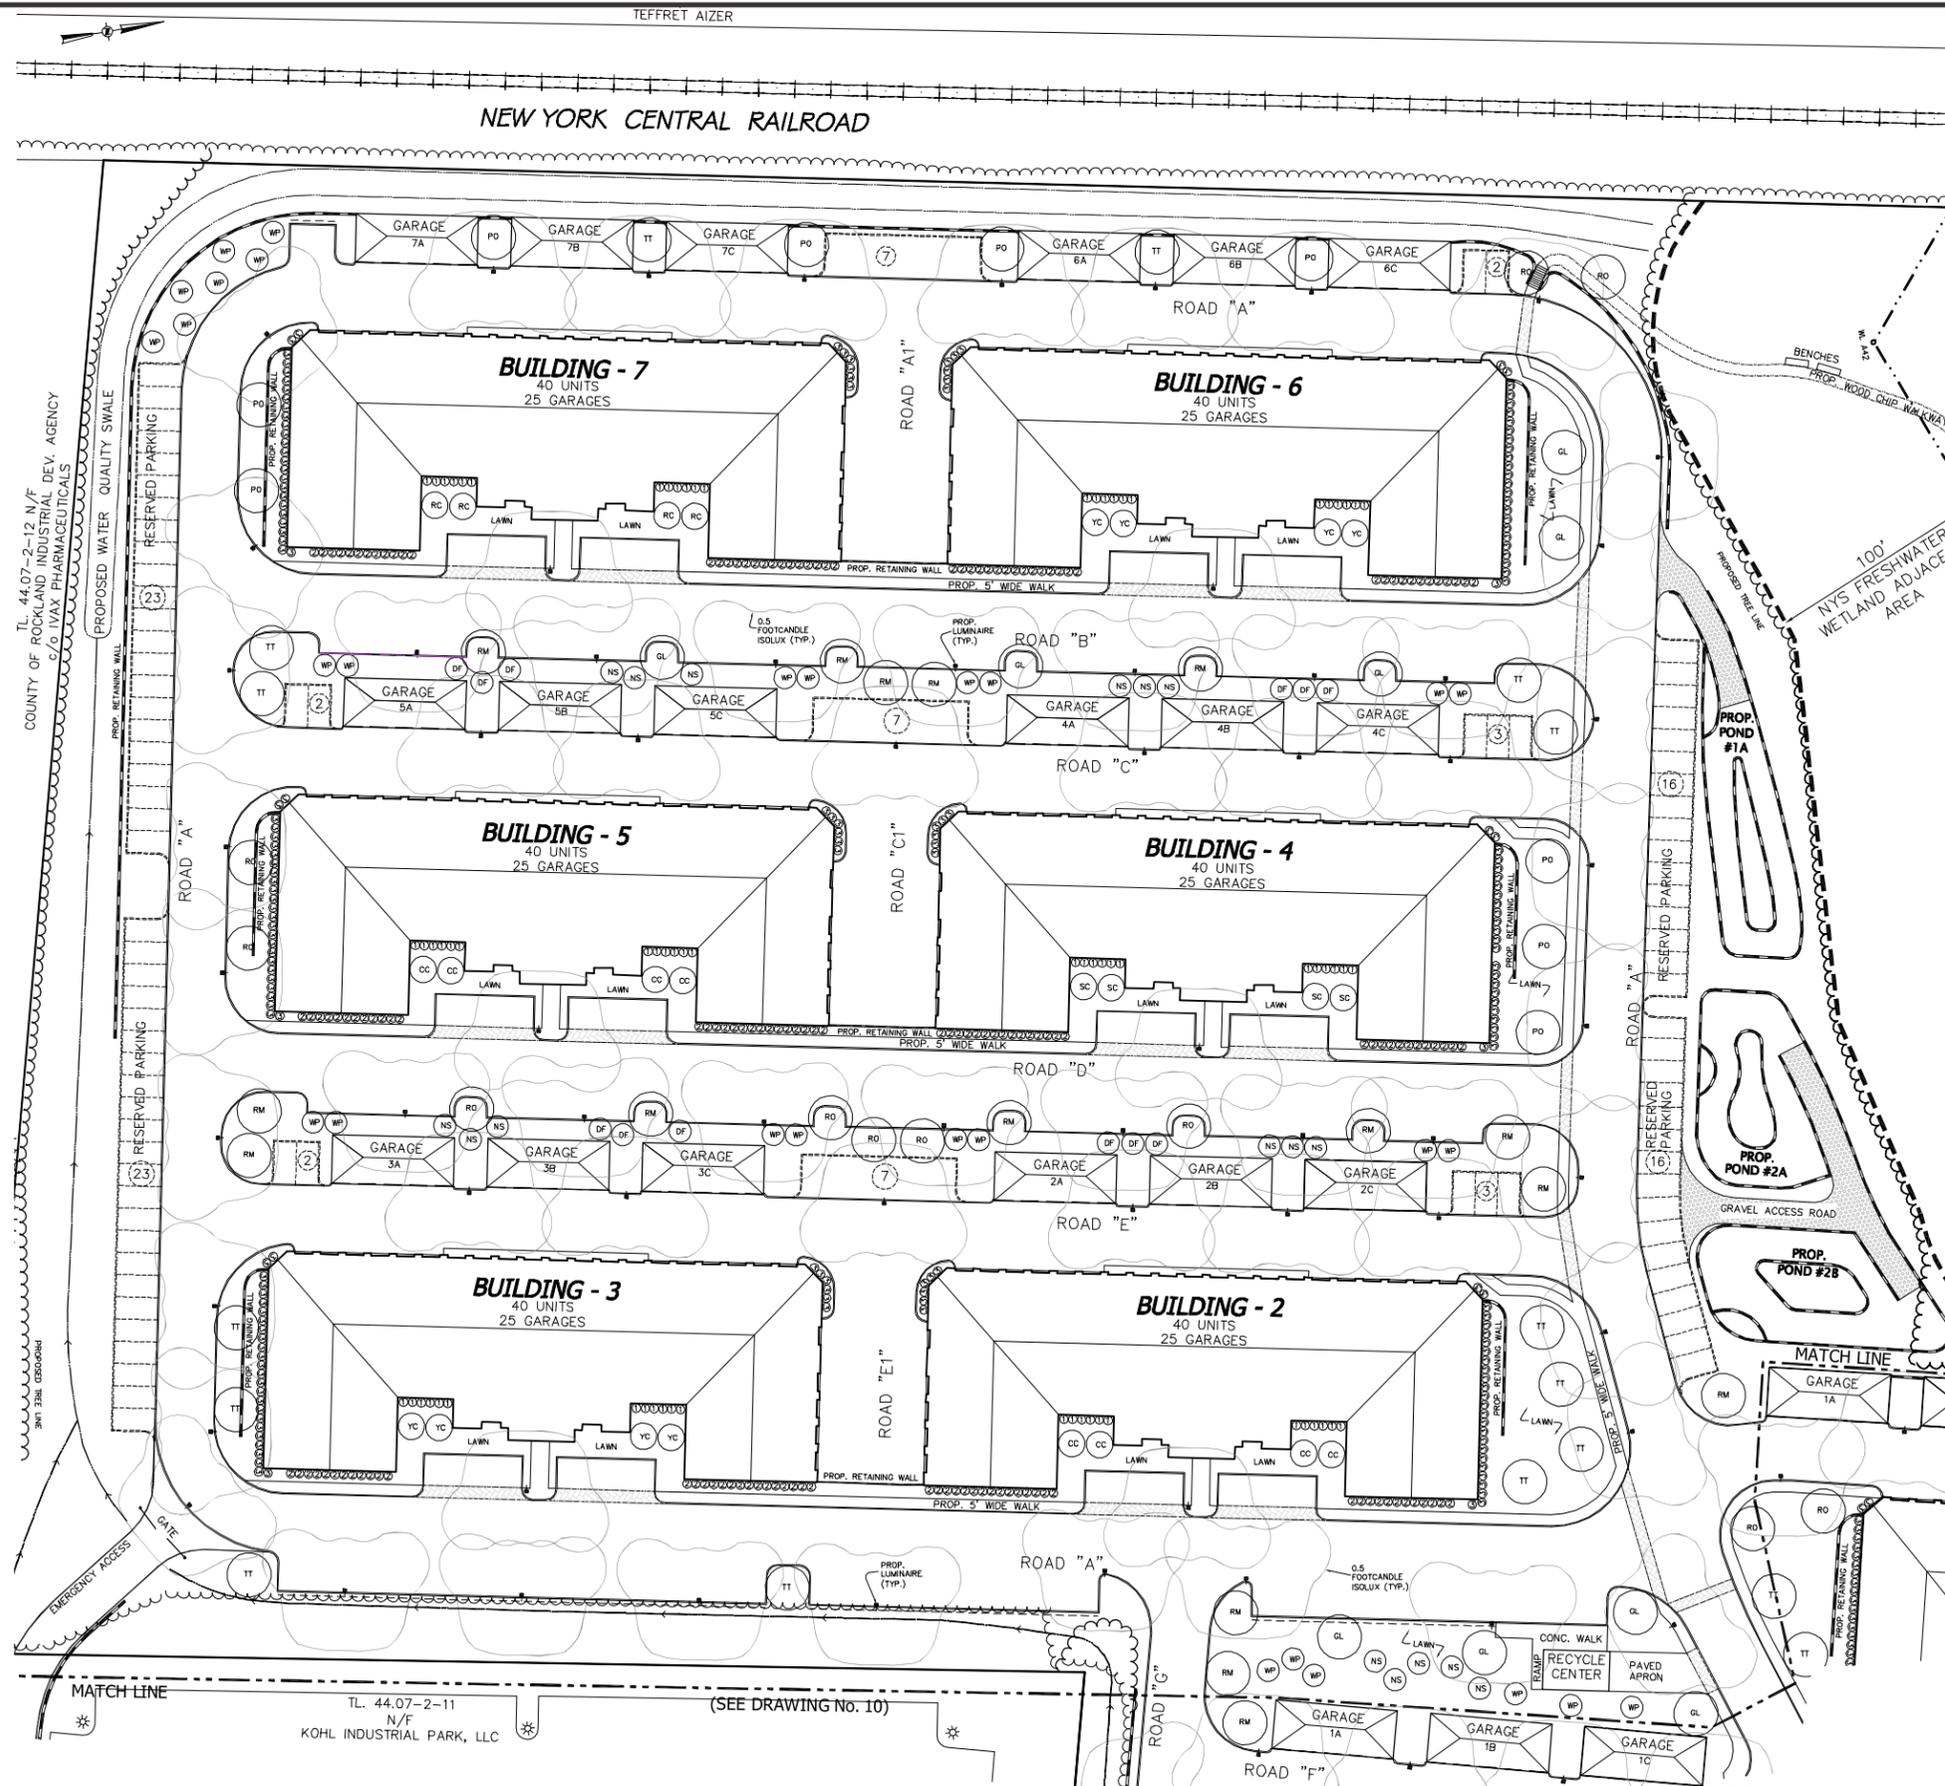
Landscape and Lighting Plan (Hemlock Drive East) Orchard Ridge
